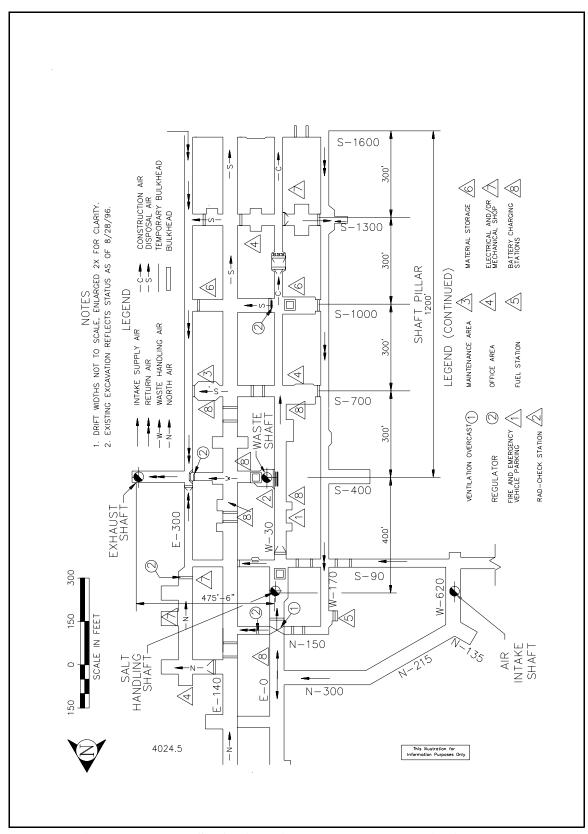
, Shaft Pillar Area Layout and Ventilation Flows
